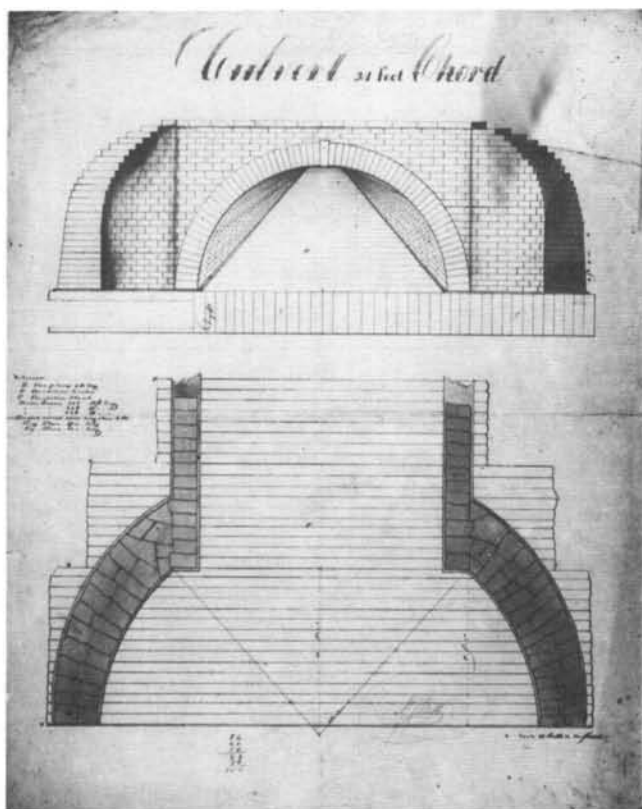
"CULVERT 24 FEET CHORD": DRAWINGS BY M.S. WEBB, WHITEWATER CANAL ENGINEER, CA. 1839
